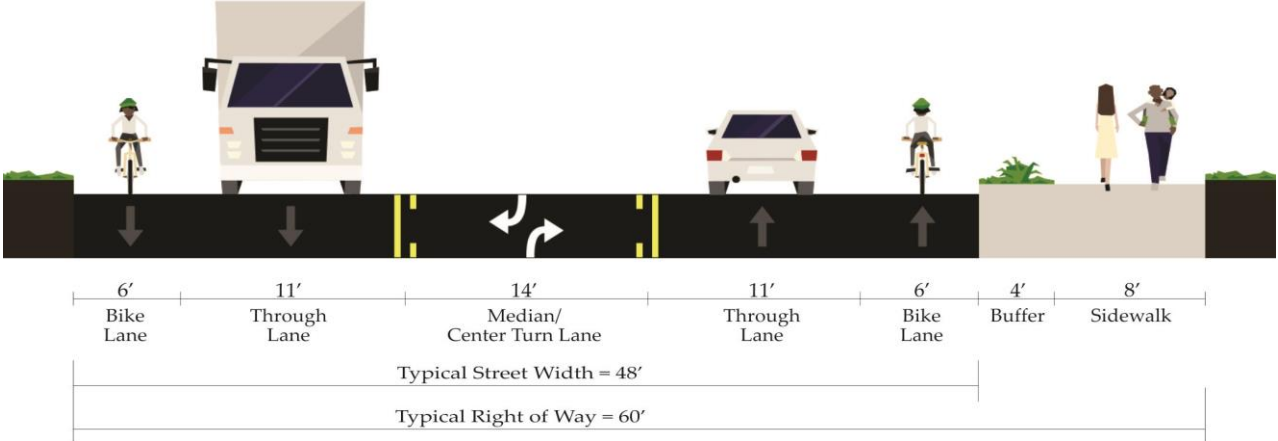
Recommended Design for W Main Street between NW 3rd Avenue and Johnson Drive
